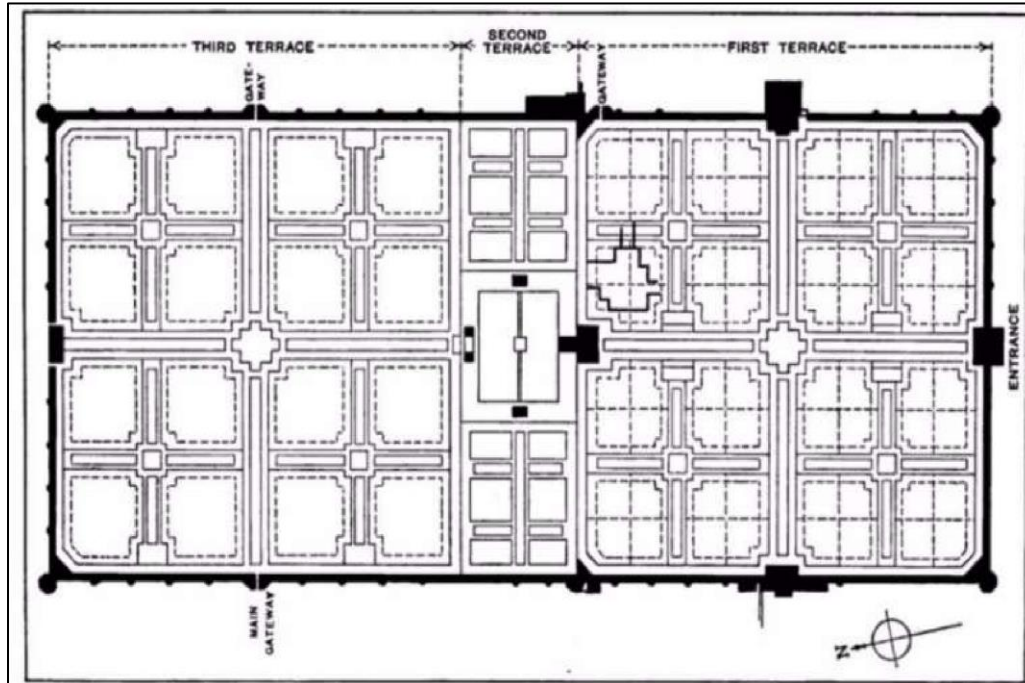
Shalimar Gardens, Lahore: Layout Plan and sampling area (encircled) (After KKM)
